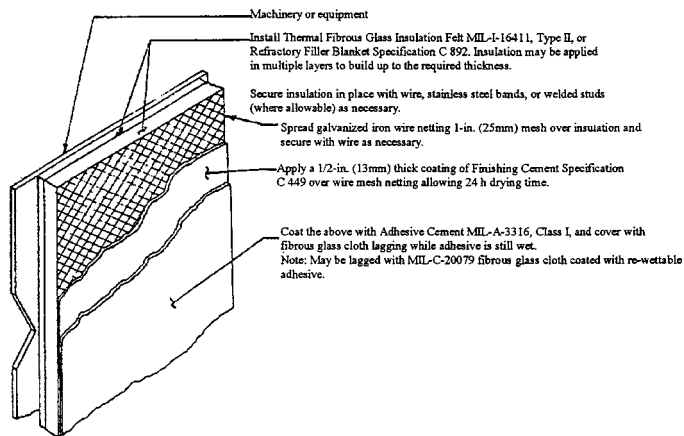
Installation of Thermal Fibrous Glass Felt Insulation (MIL-I-16411) or Refractory Fiber Blanket Insulation (Specification C 892) on Machinery and Equipment (126 to 1200°F) (52 to 649°C)
